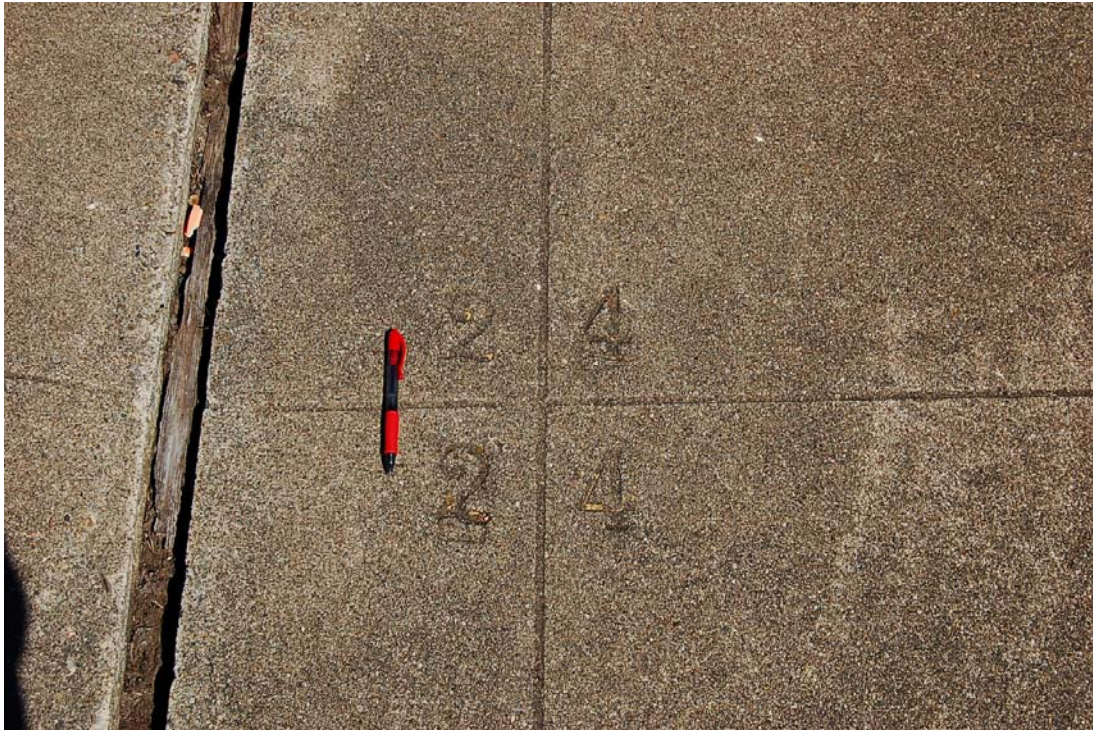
Detail of stamped distances for trap yardage markers found on the interior paved areas in Fields 4 to 7 (D. Bradley, September 2013).
